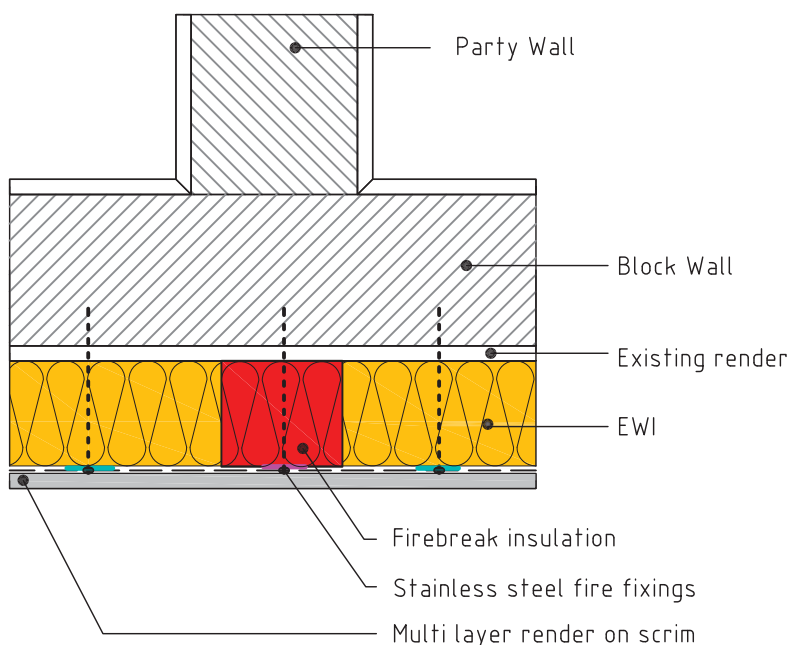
Fire break to vertical or horizontal junction, floor or party wall
